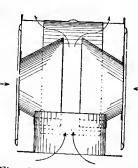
Sectional View of Gold's Cyclone Ventilator.
